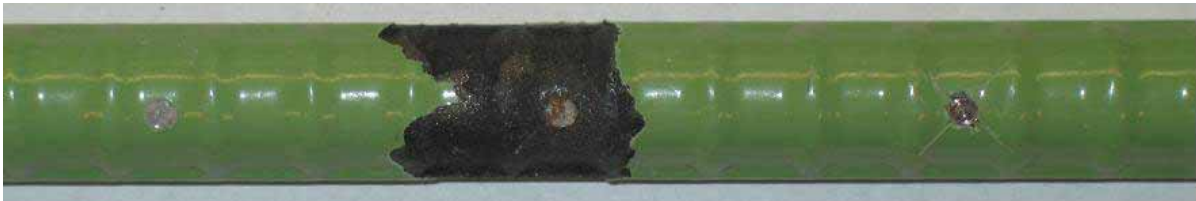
Photo. Conventional epoxy-coated top bar from southern exposure specimen containing Hycrete™ after 96 weeks.
